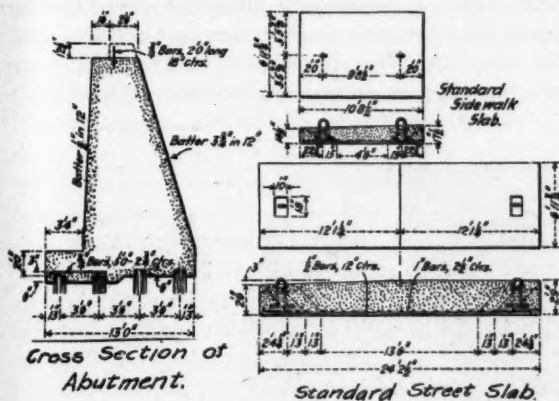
TYPICAL SECTIONS, ROADWAY CONCRETE CONSTRUCTION, C., B. & Q. RY.
